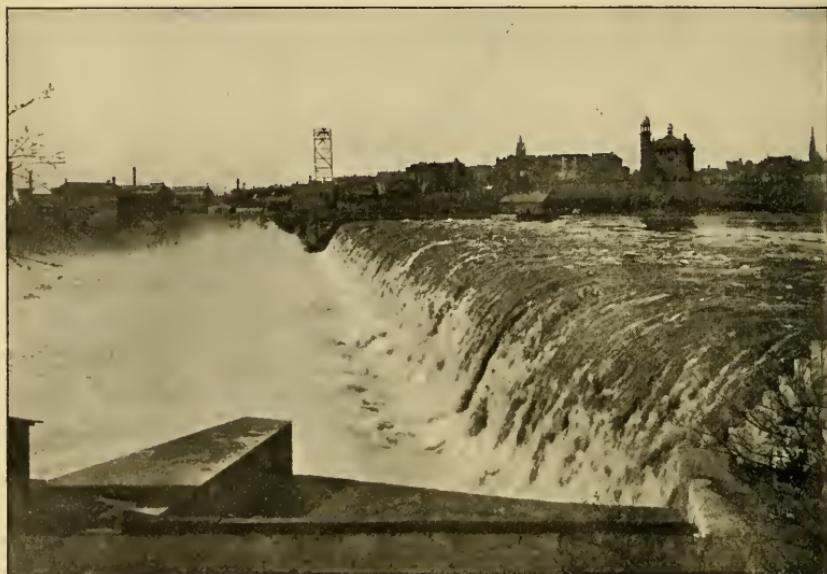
HOLYOKE DAM, APRIL 20, 1900. WATER 9 FEET 7 INCHES DEEP ON CREST OF DAM.
